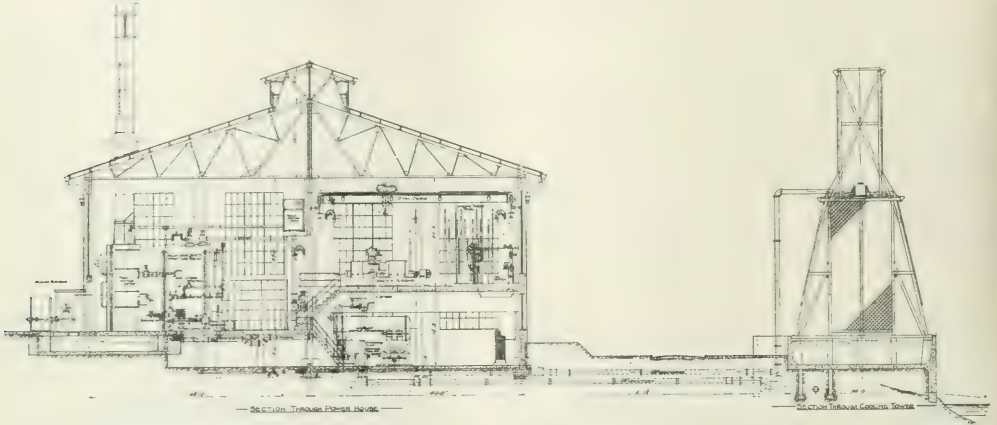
VERTICAL SECTIONS OF STATION AND COOLING TOWER
